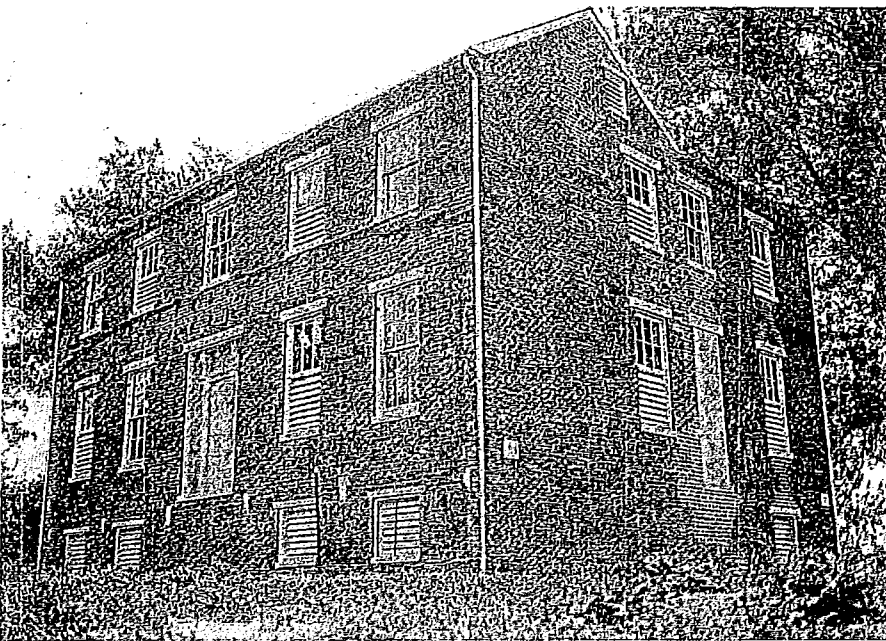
Proper mothballing treatment: This building has been successfully mothballed for 10 years because the roof and walls were repaired and structurally stabilized, ventilation louvers were added, and the property is maintained. Photo: Charles E. Fisher, NPS.
